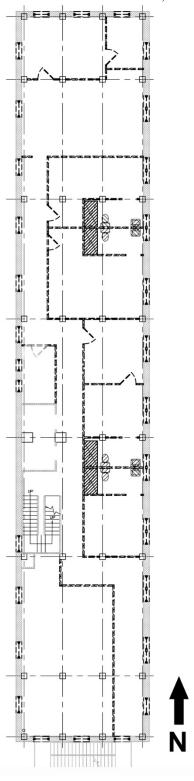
Ninth floor current plans. This floor is almost entirely open. Source: Wallace Architects, "Baxter Lofts Rehabilitation Plans," 2017.
